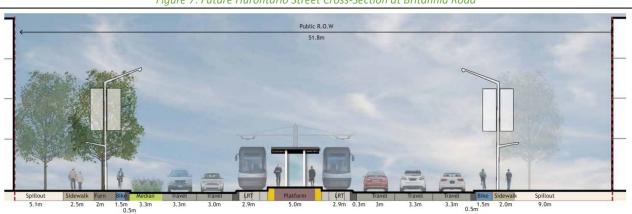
Future Hurontario Street Cross-Section at Britannia Road
